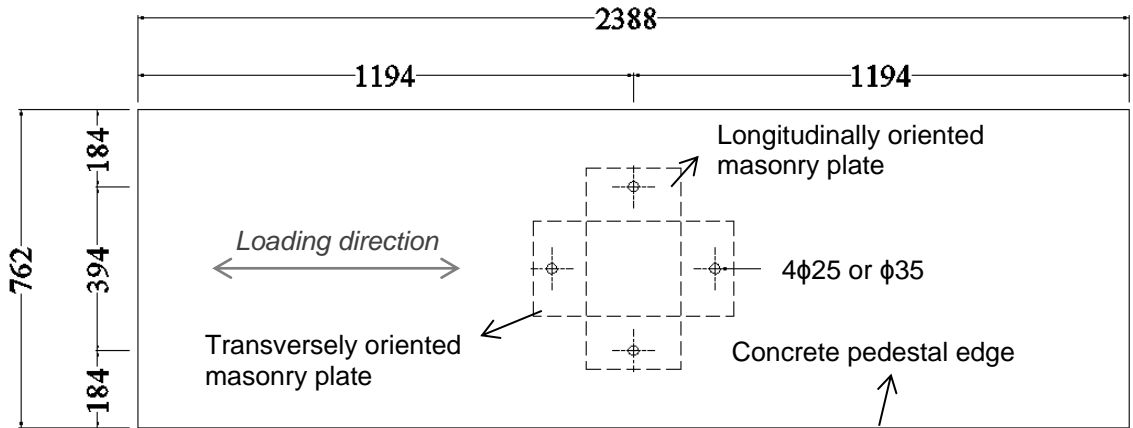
Layout of anchor bolts in the concrete pedestal (units are in mm)
